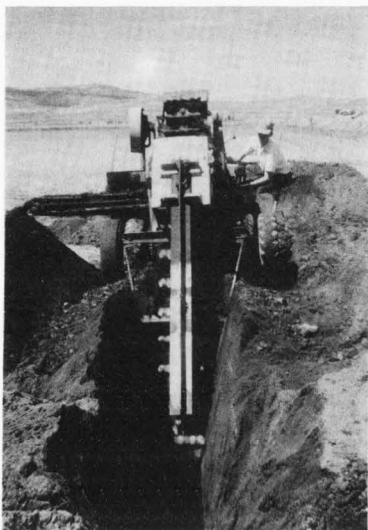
Trenching machine excavating trench for plastic barrier curtain.
